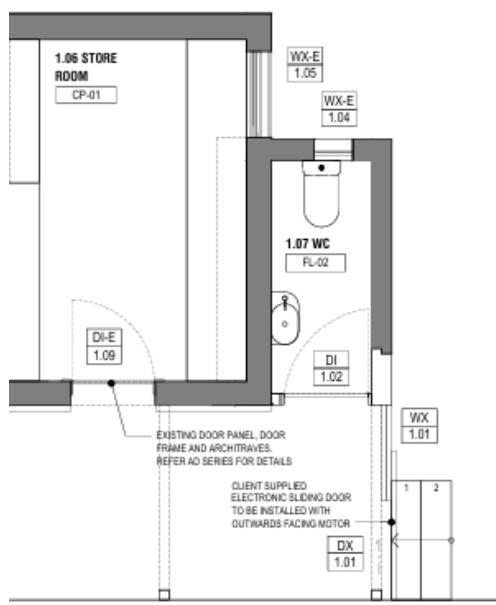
Part plan of proposed rear bathroom (Studio C+E drawing AC 1.01)
